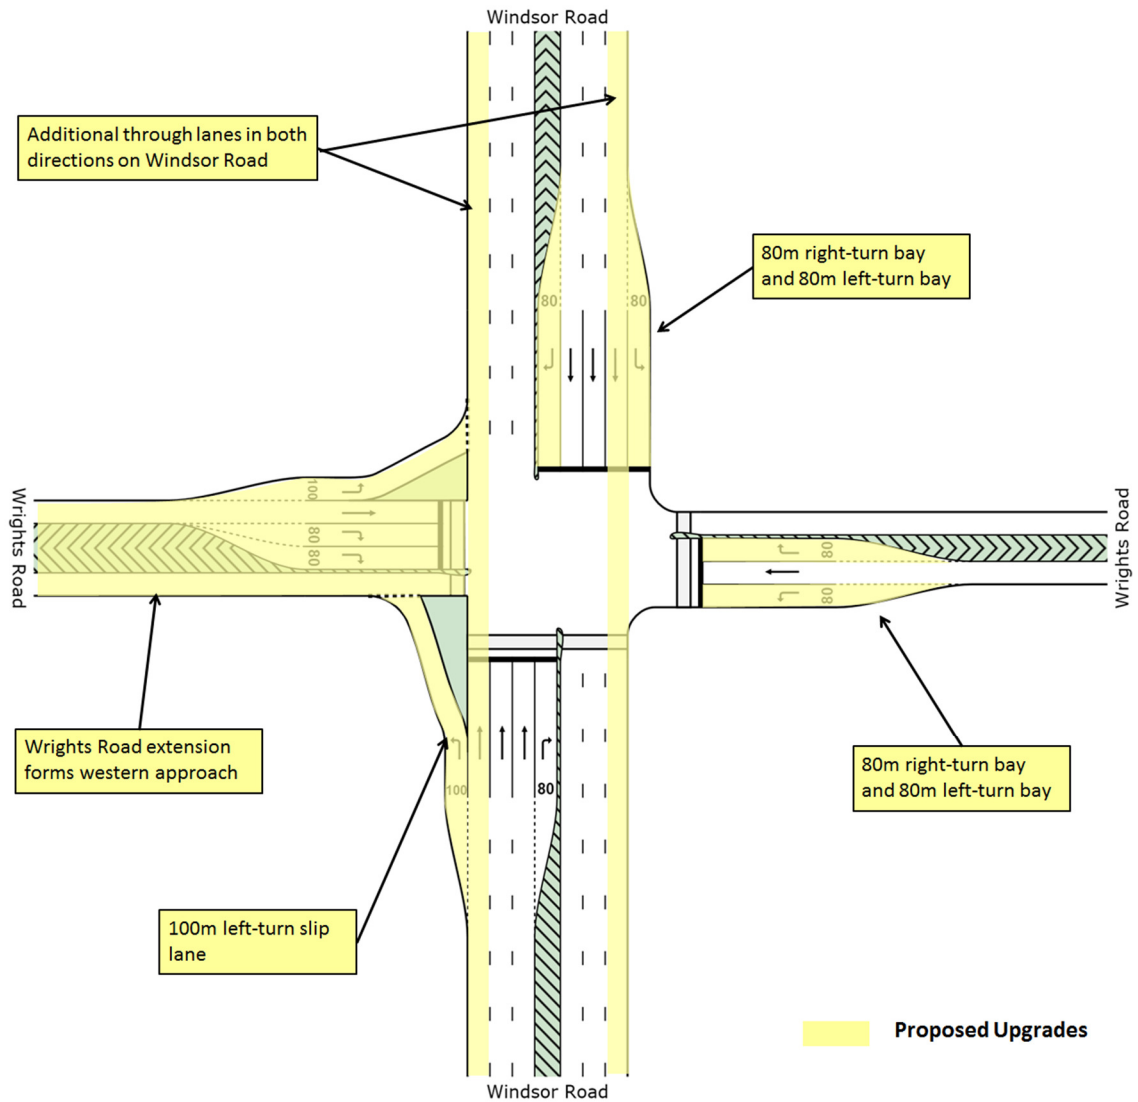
Proposed layout of Windsor Road and Wrights Road intersection
